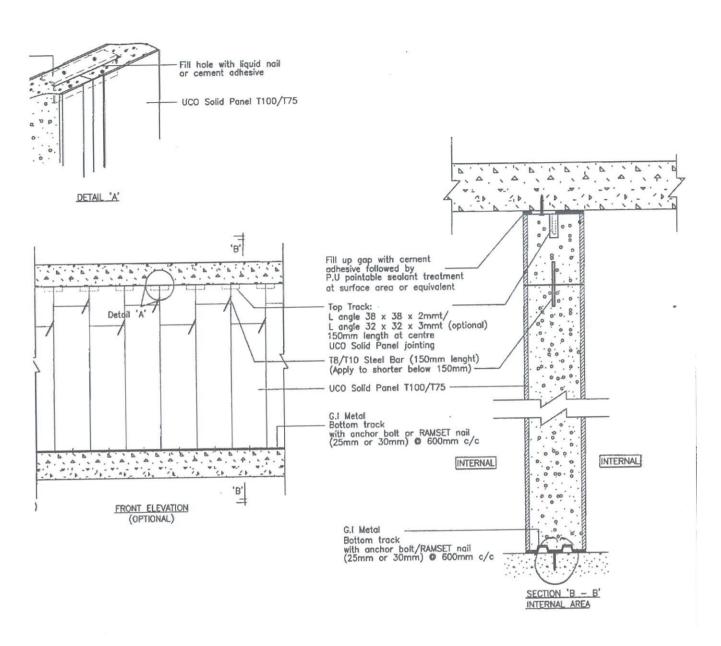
UCO Bhd's UAC lightweight concrete solid wall panel typical detail.
